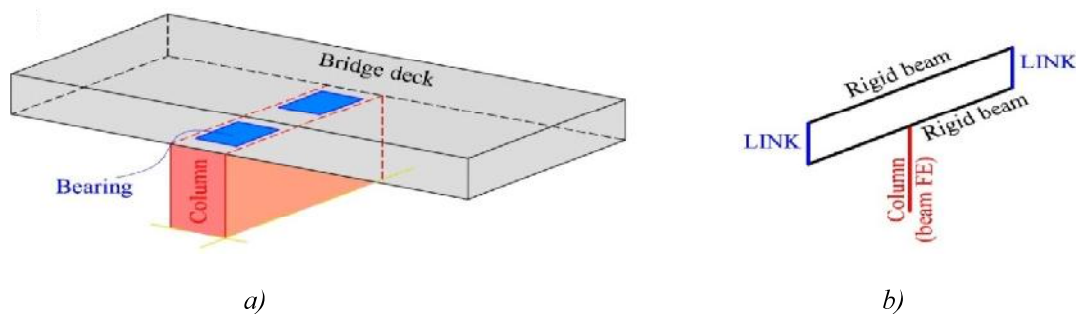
Modelling of the supports: a) real structure, b) beam model with link elements
